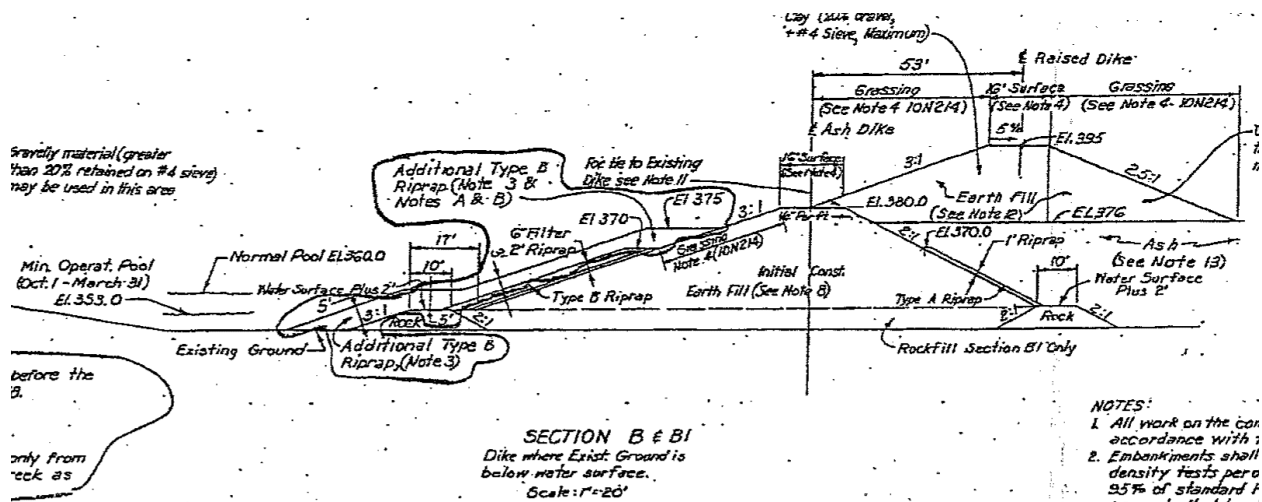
Typical Perimeter Dike Cross Section when Existing Ground was Below the Water Surface (TVA Drawing No. 10N213R6)
